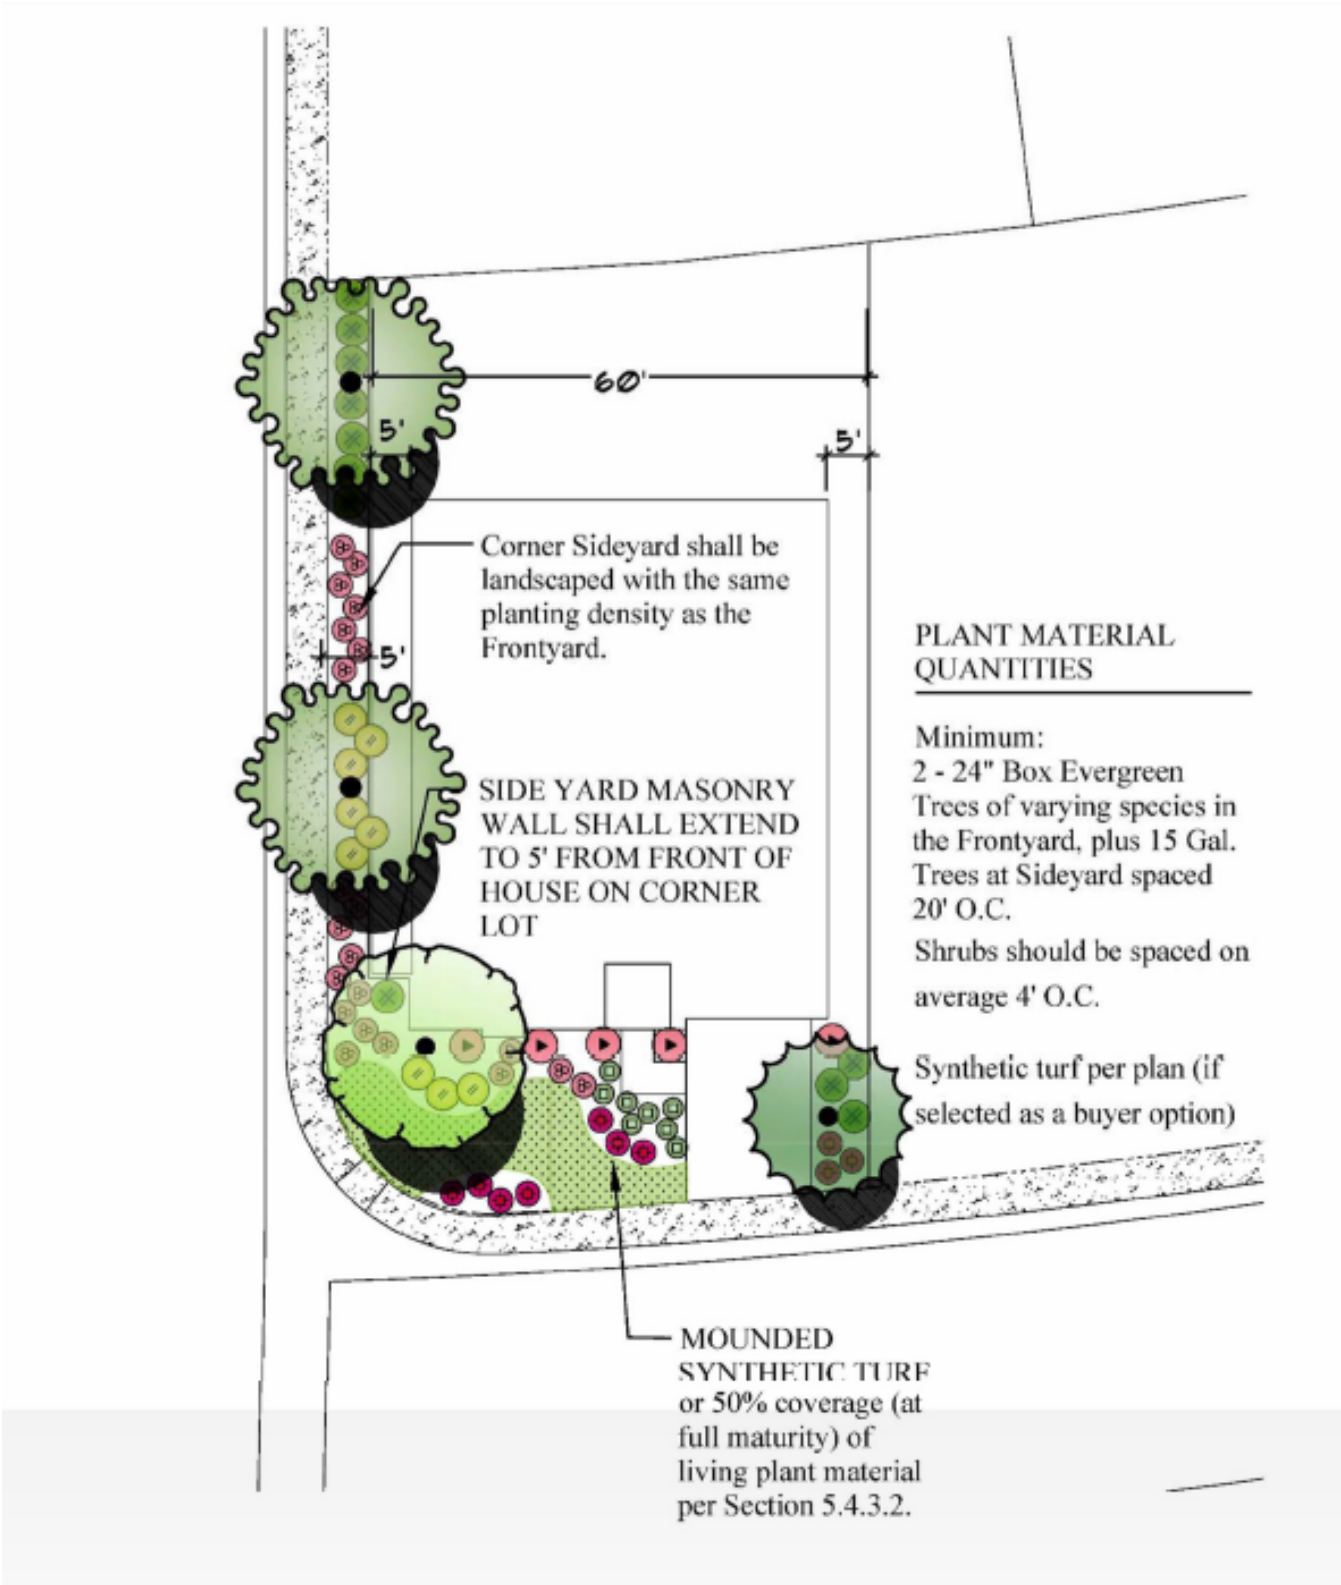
N: TYPICAL CORNER FRONT YARD
